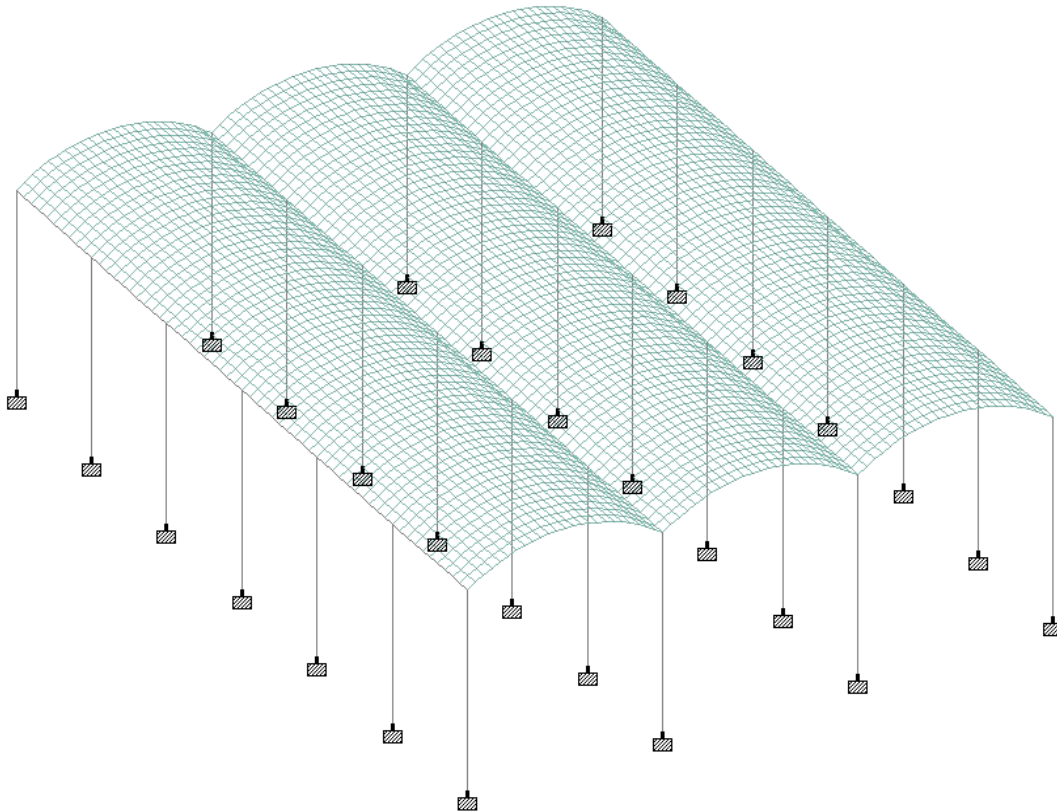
3D view of RC shell rise 1m, span 6m
